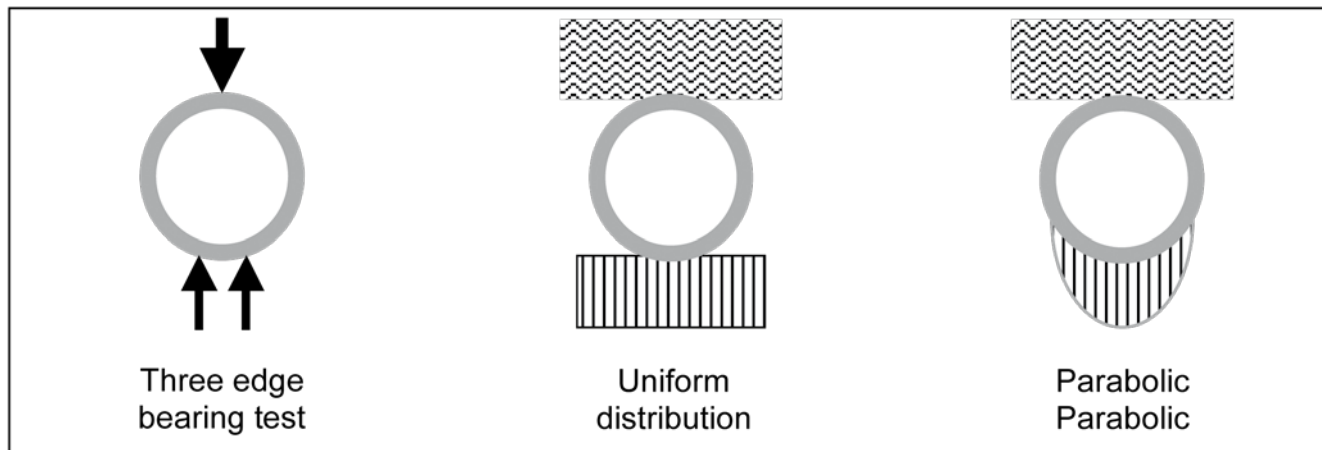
FACTORY STRENGTH AS MODEL OF INSTALLED LOAD ON PIPE
